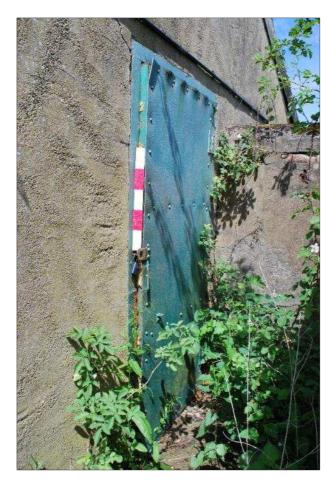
(Shot 5): Steel door on east elevation, looking northwest (0.5m scale)
